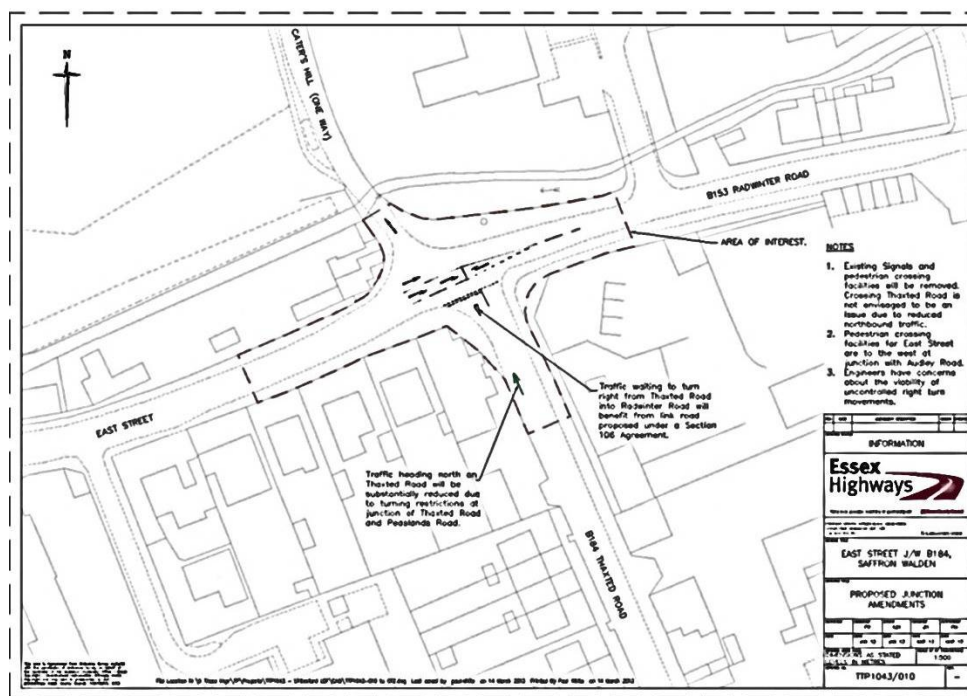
Thaxted Road / Radwinter Road junction with Priority layout (MM3)
